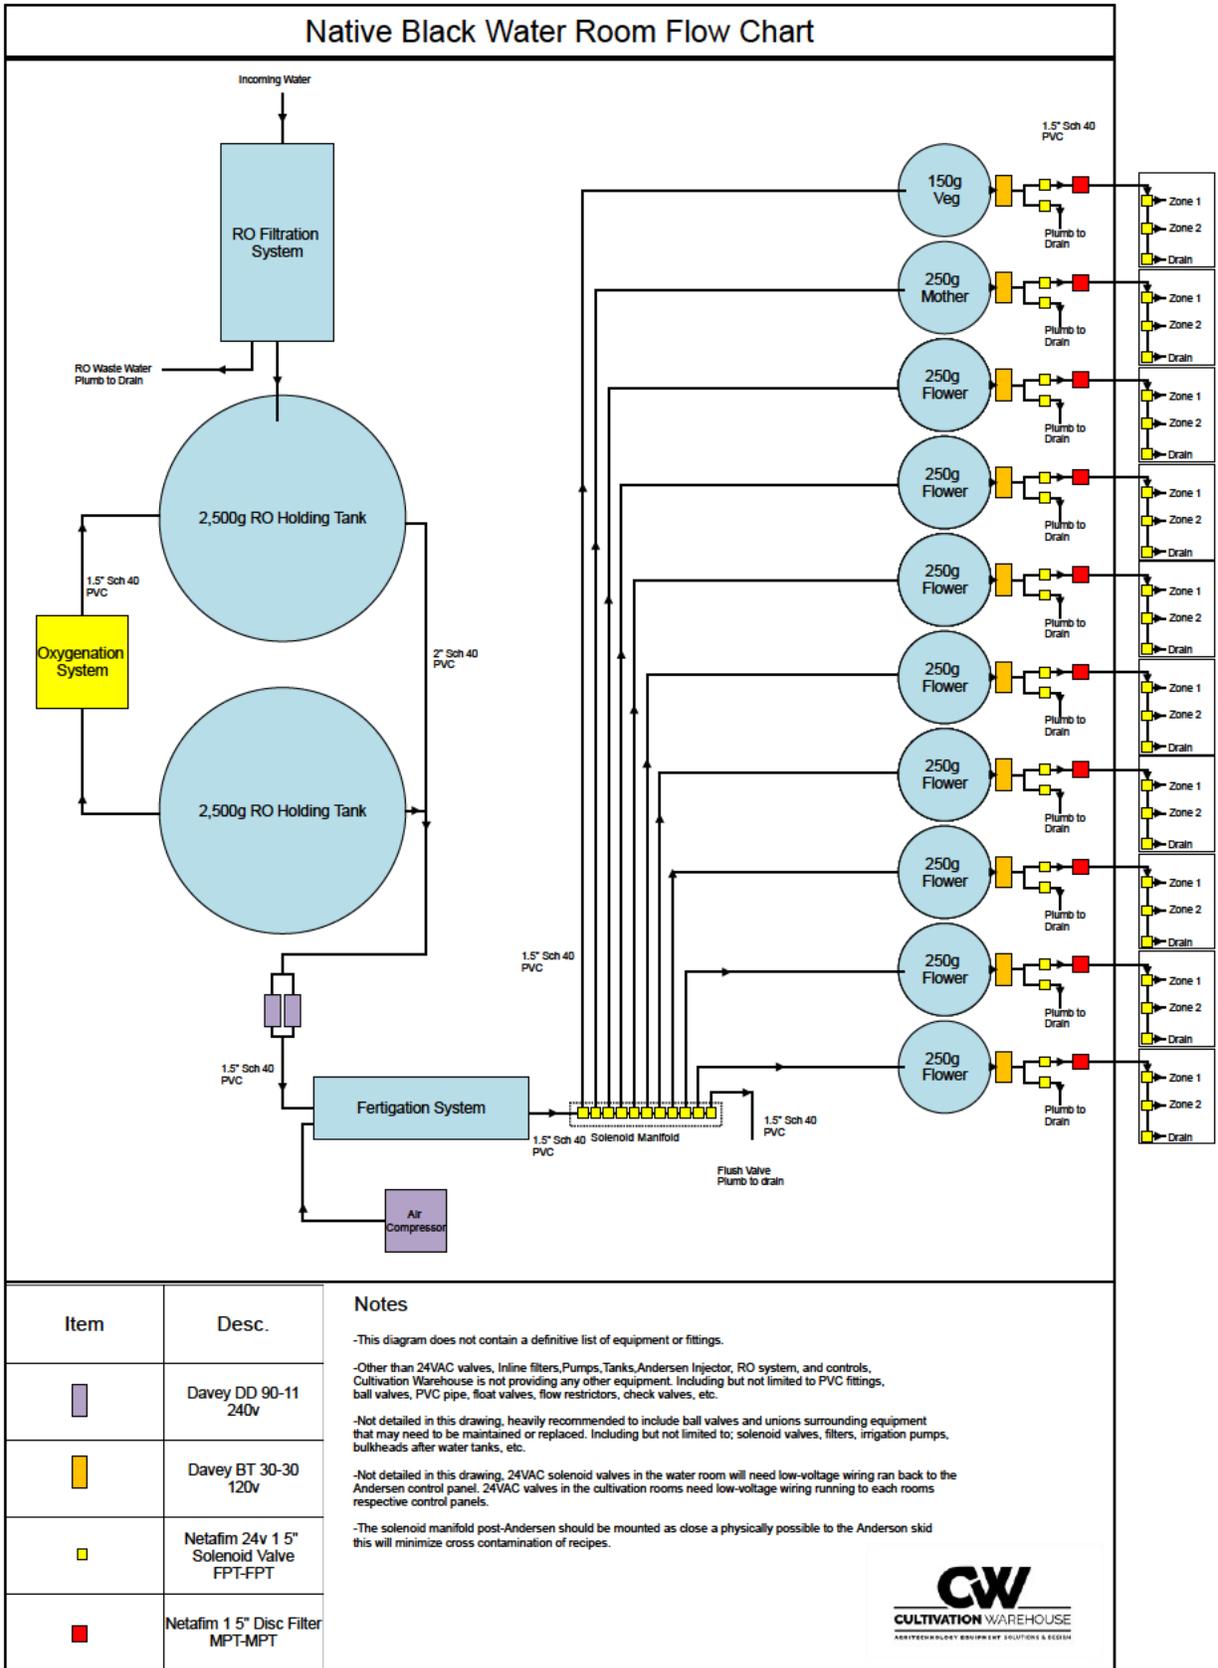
Engineering Plans and Specifications (Cultivation Facilities).
